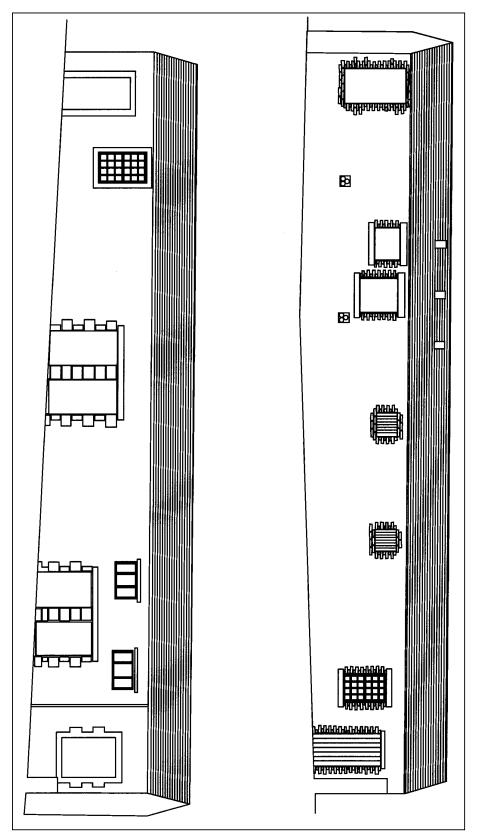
(Above) NW Elevation of Stable Block (Below) SE Elevation. Scale: 1:100
